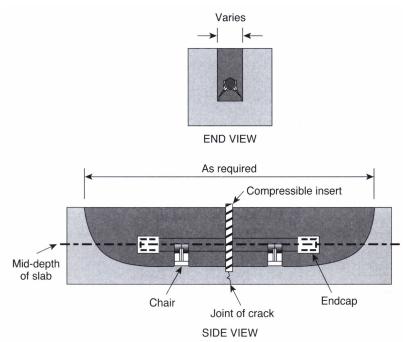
Retrofitted dowel installation details (ACPA 2006).
